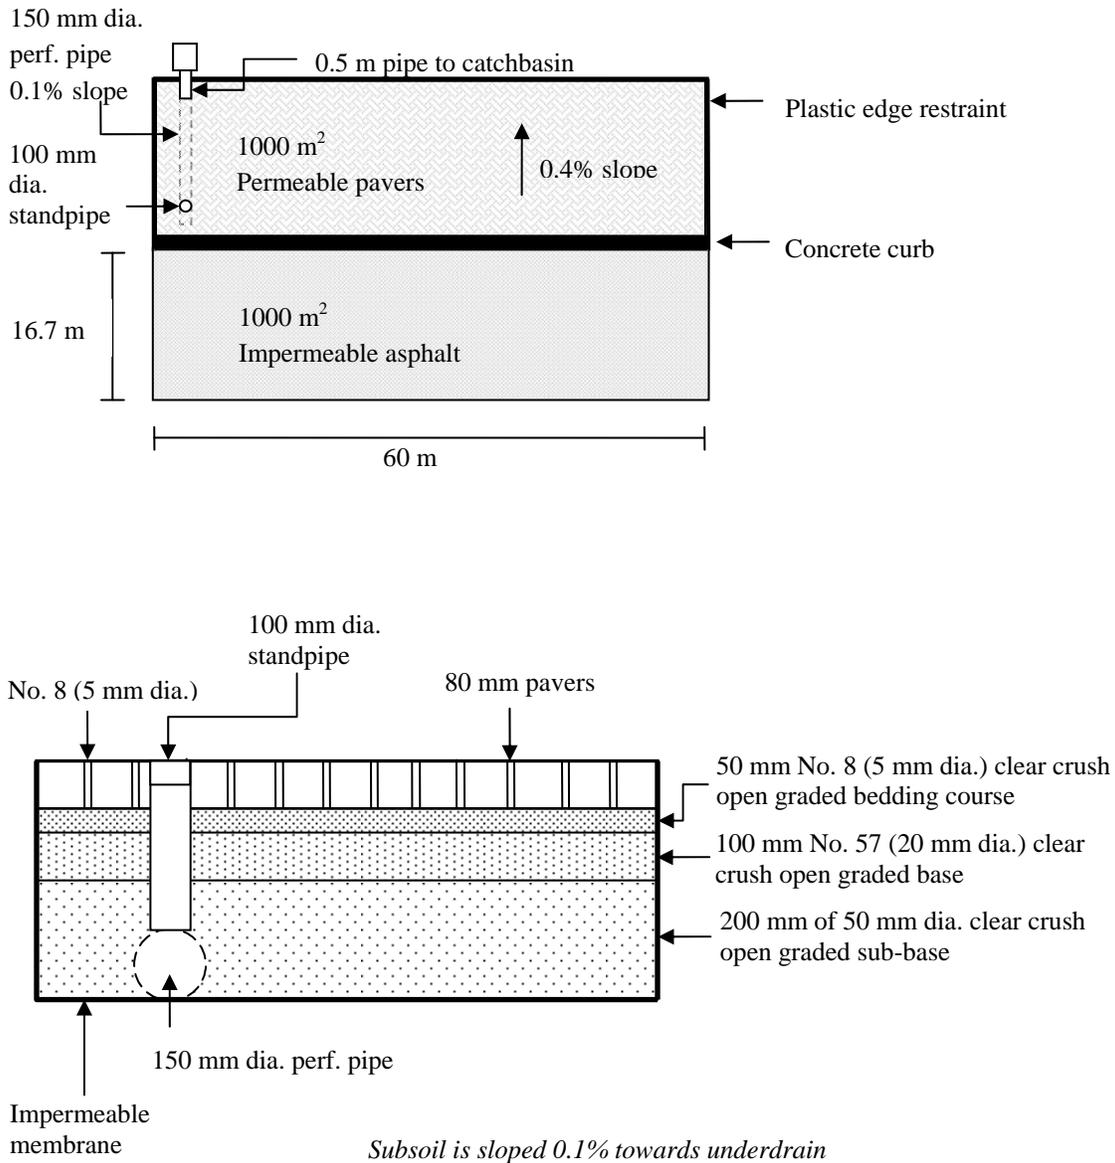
Permeable pavement no infiltration design. Plan view (top); cross section (bottom)
